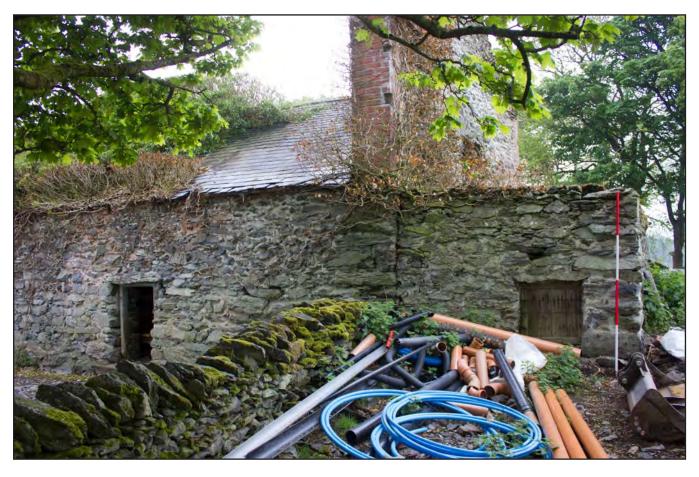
Northeast elevation of Building 4 - Cowhouse/Shippon at Gaer Gerrig, Llangwm, Conwy - from the northeast - 2.00m scale
